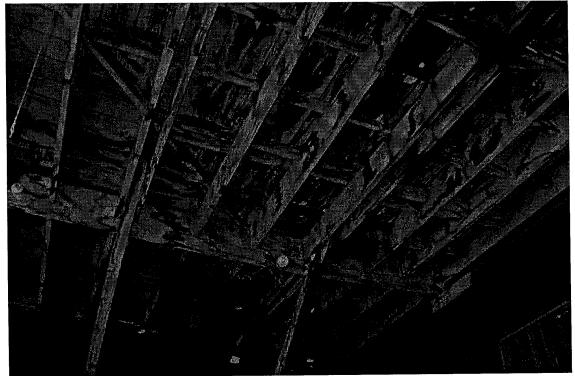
639 Arlington Ave. – Interior (MH, 2006)
